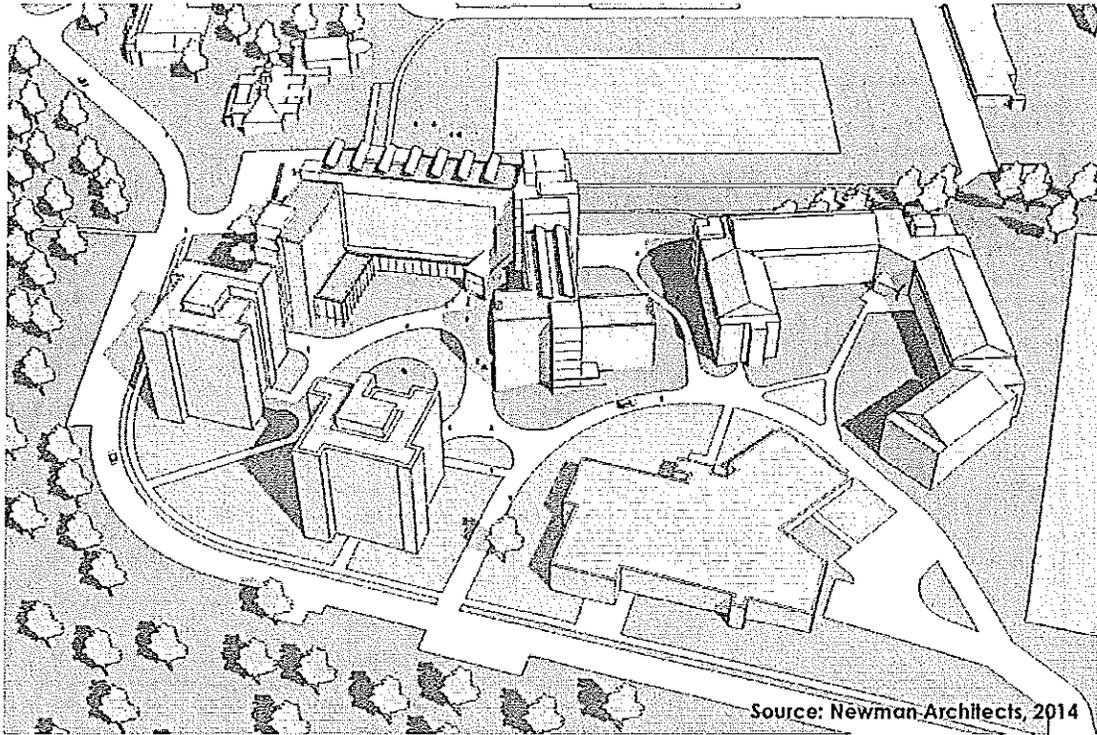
Proposed STEM Residence Hall Architectural Rendering Facing East
